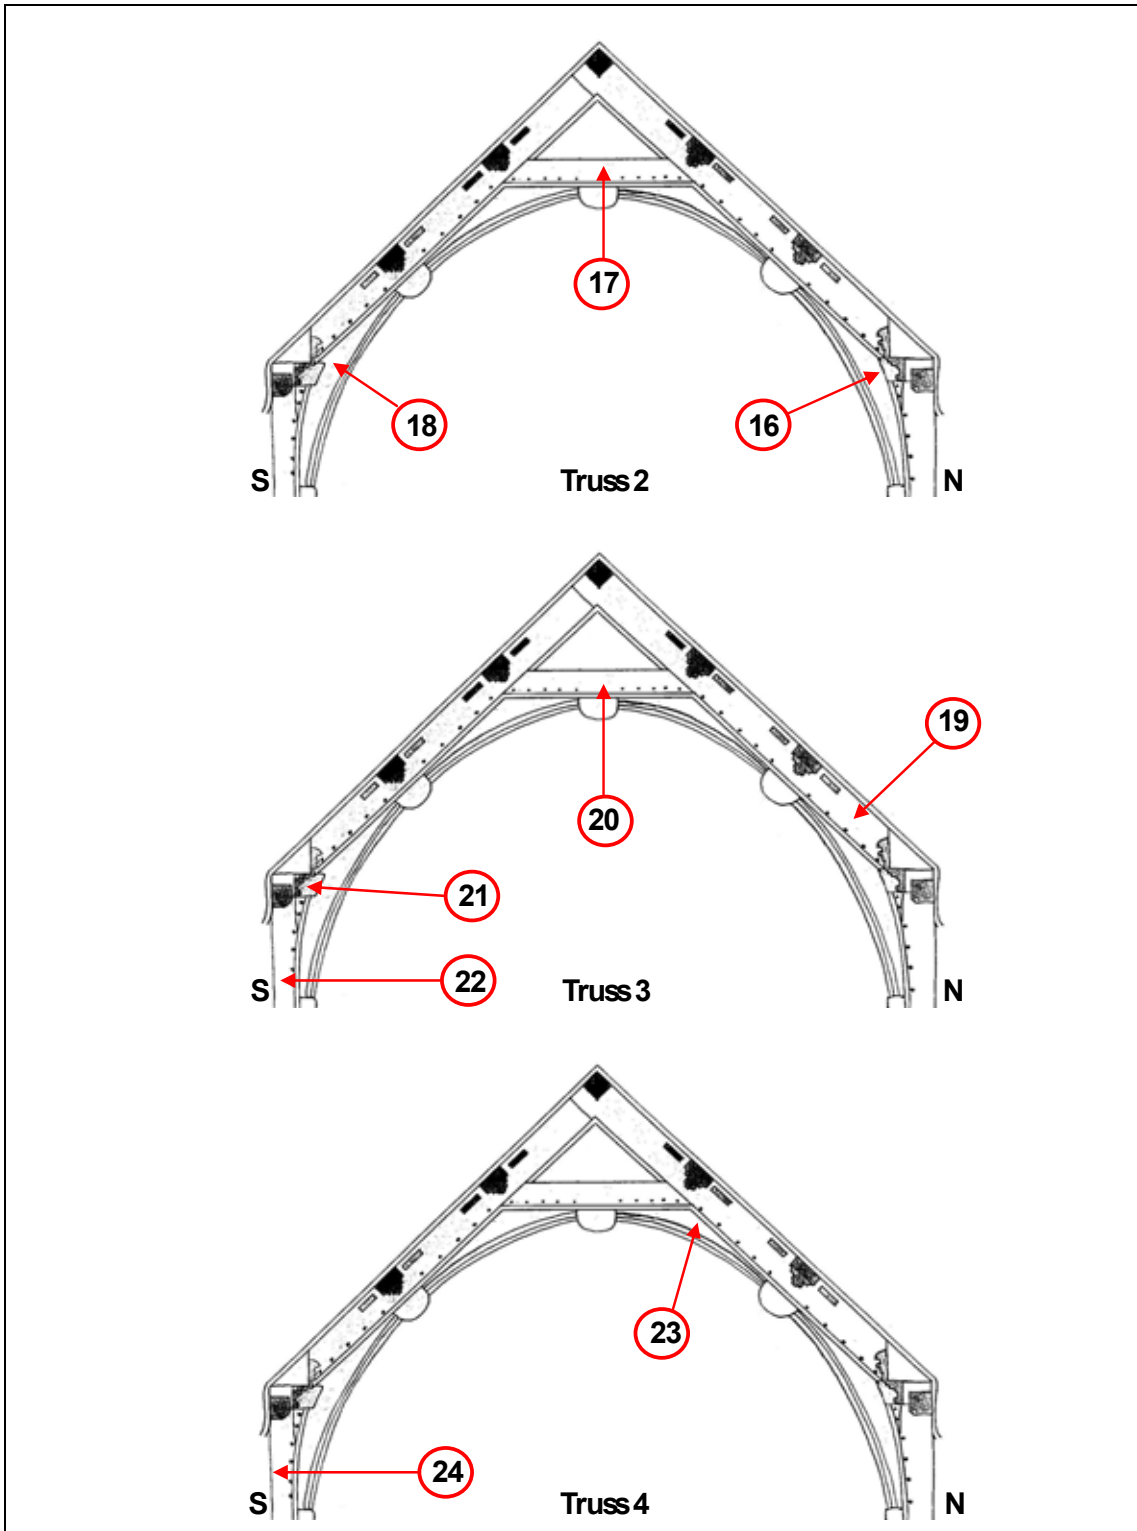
Eastern trusses 2–4 of the hall roof to show sampled timbers
